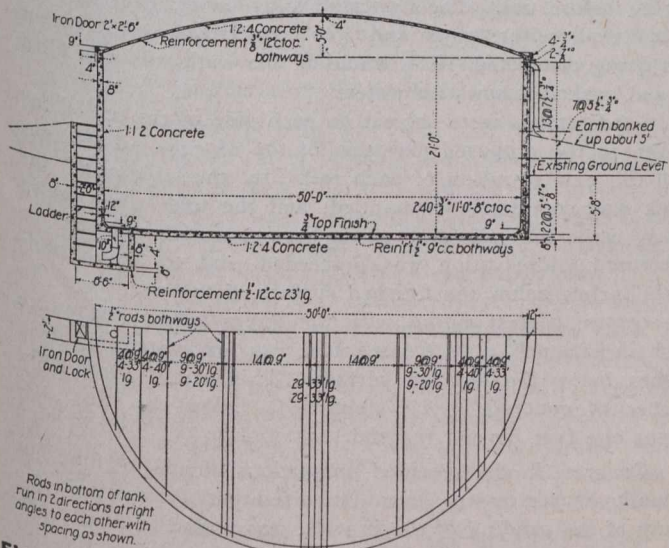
Details of Design of New 300,000-Gallon Reinforced Concrete Standpipe for Penetanguishene, Ontario, Waterworks.
